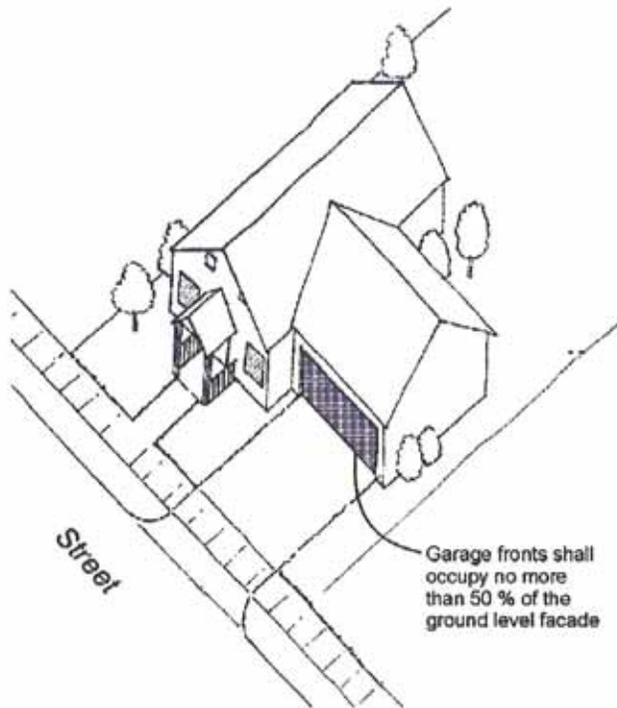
Where a garage wall faces the street, it shall occupy no more than fifty percent of the ground-level facade.
